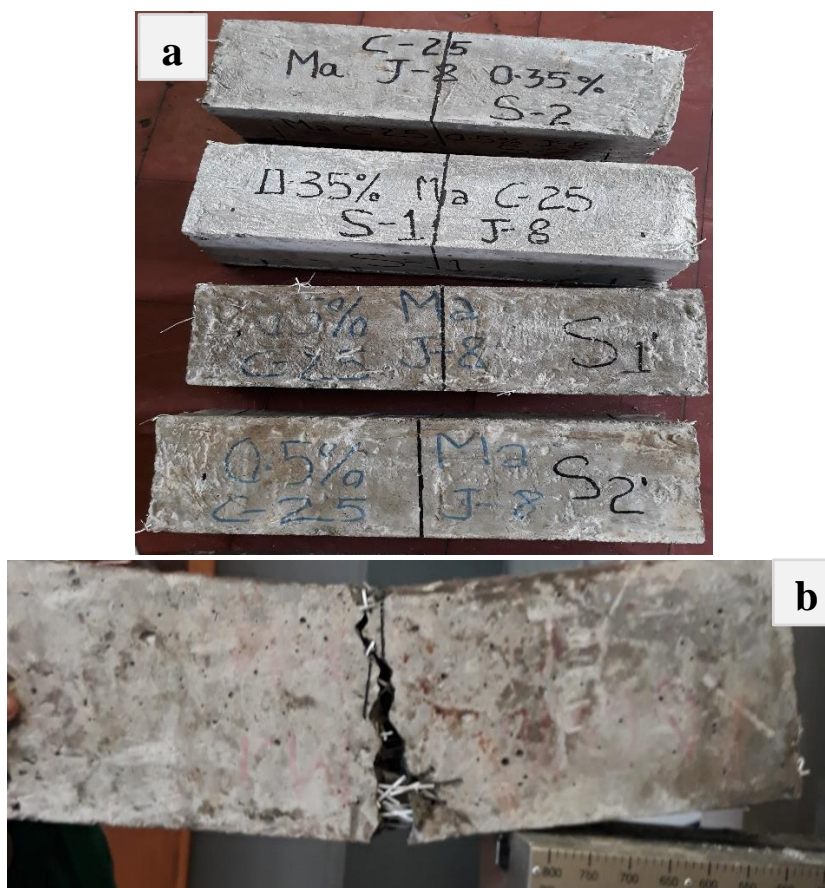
Failure stages of macro synthetic fiber concrete beam: a) Specimen prepared for test; b) after failure
